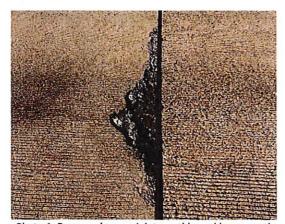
Damaged armor joint, northbound lanes, north abutment
